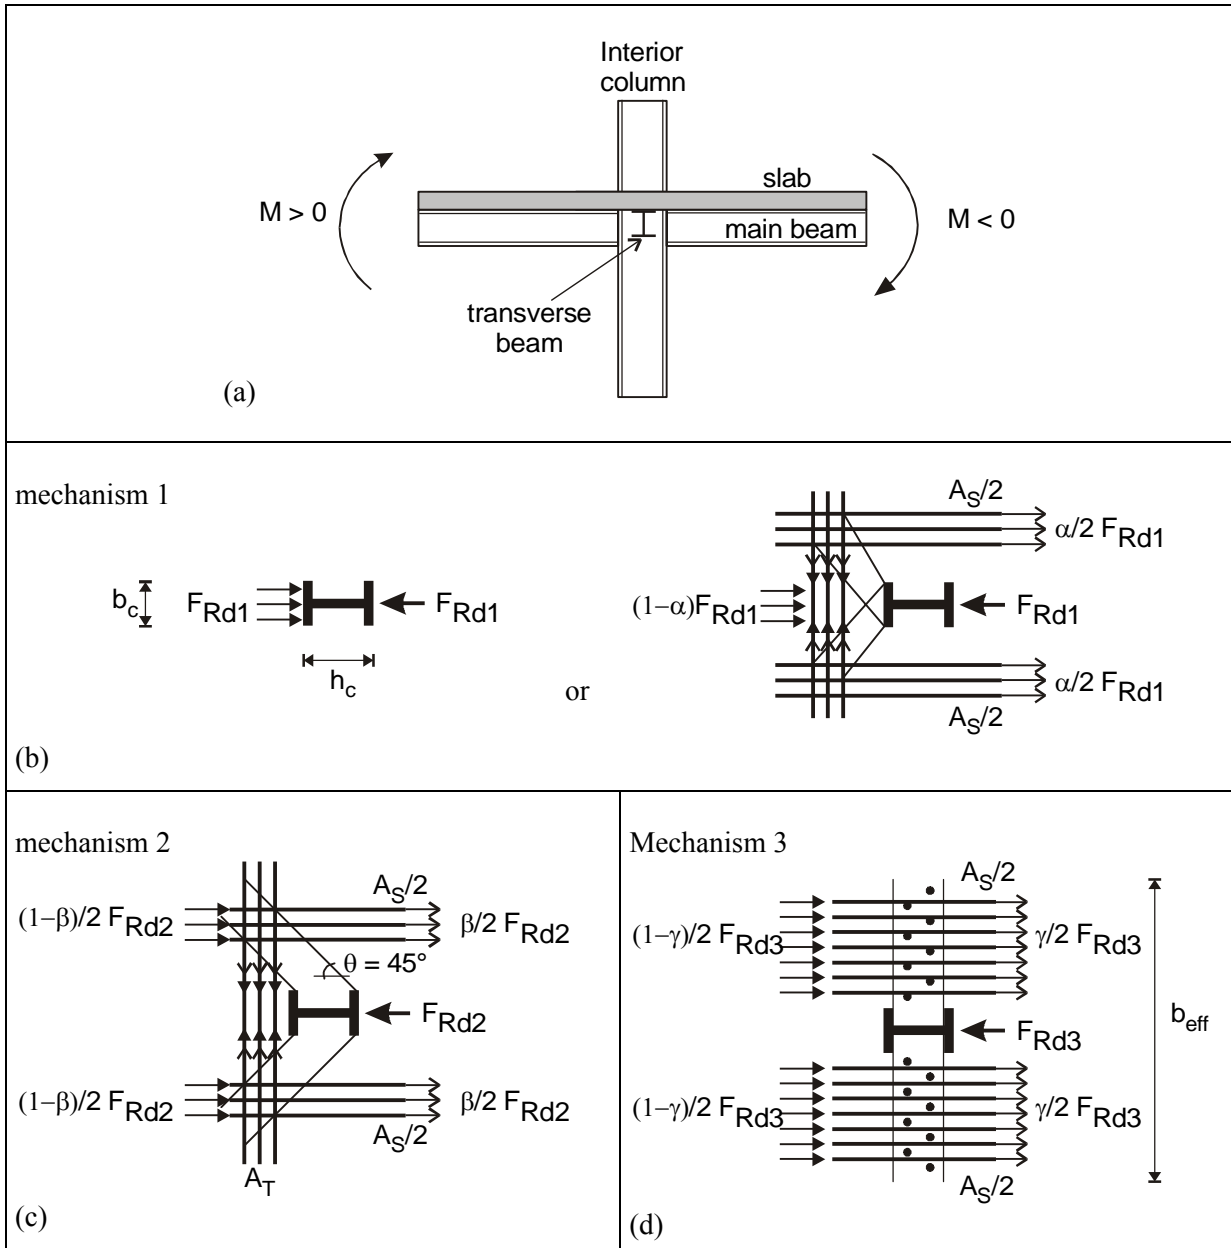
Possible transfer of slab forces in an interior composite beam-to-column node with and without transverse beam under positive bending moment at one side and negative bending at the other side
